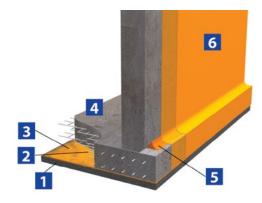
Recommended waterproofing method for the foundation slab: 1 - lean concrete; 2 - reinforcement; 3 - Hydrostop-Mix sifted under slab (3kg/m²); 4 - edge of slab sealed with Hydrostop-Proffessional Compound; 5 - wedge-shaped seal from Hydrostop-Mortar; 6 - vertical waterproofing from Hydrostop-Proffessional Compound.
